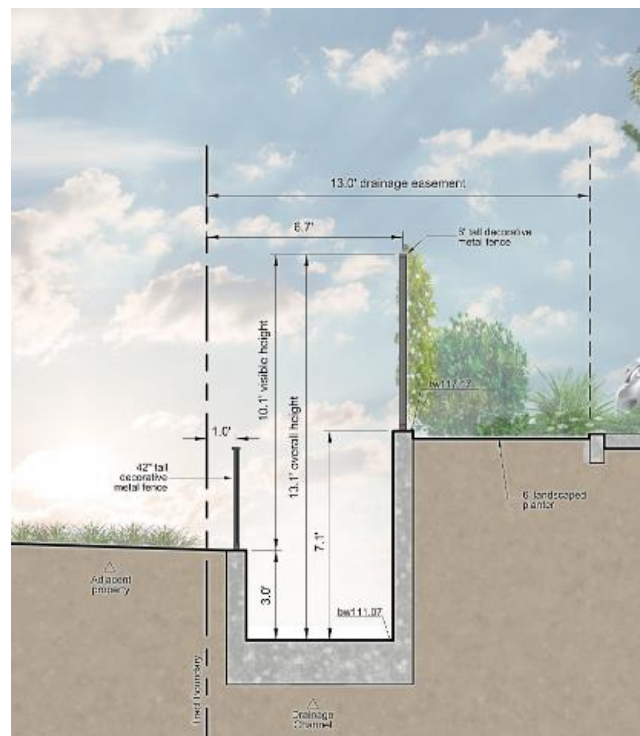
Proposed Wall/Fence Height Exception on North and West Boundaries
